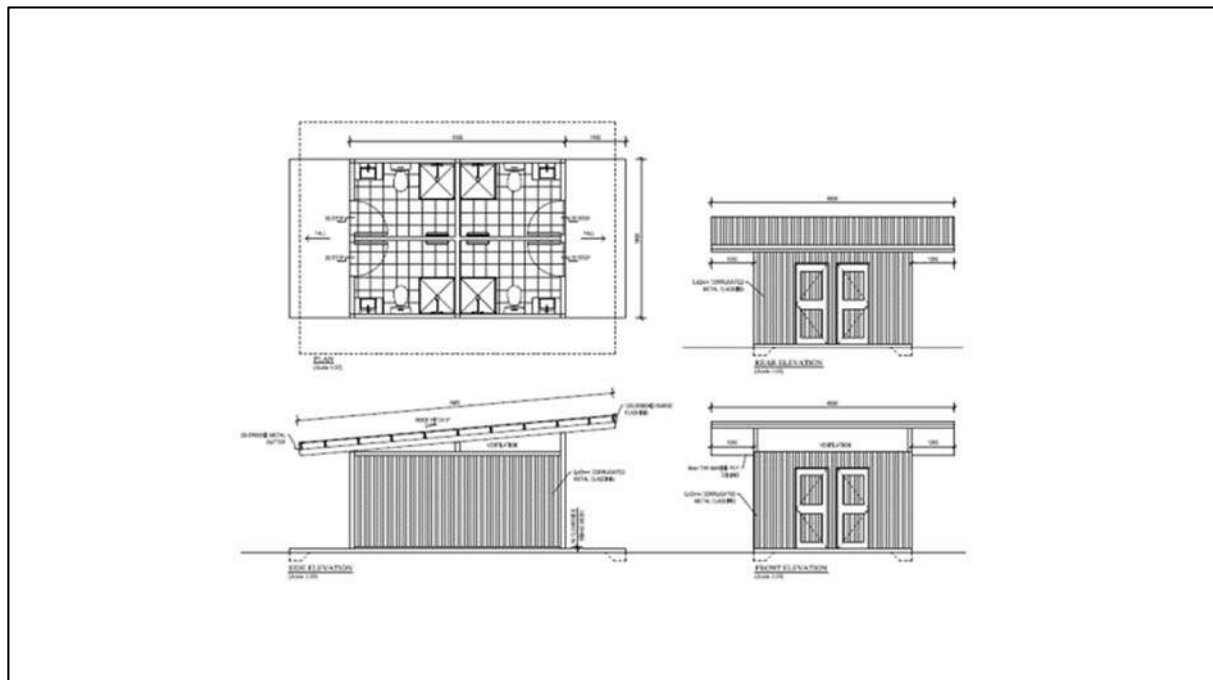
Concept Drawing 2 – Proposed Ablution Block layout
